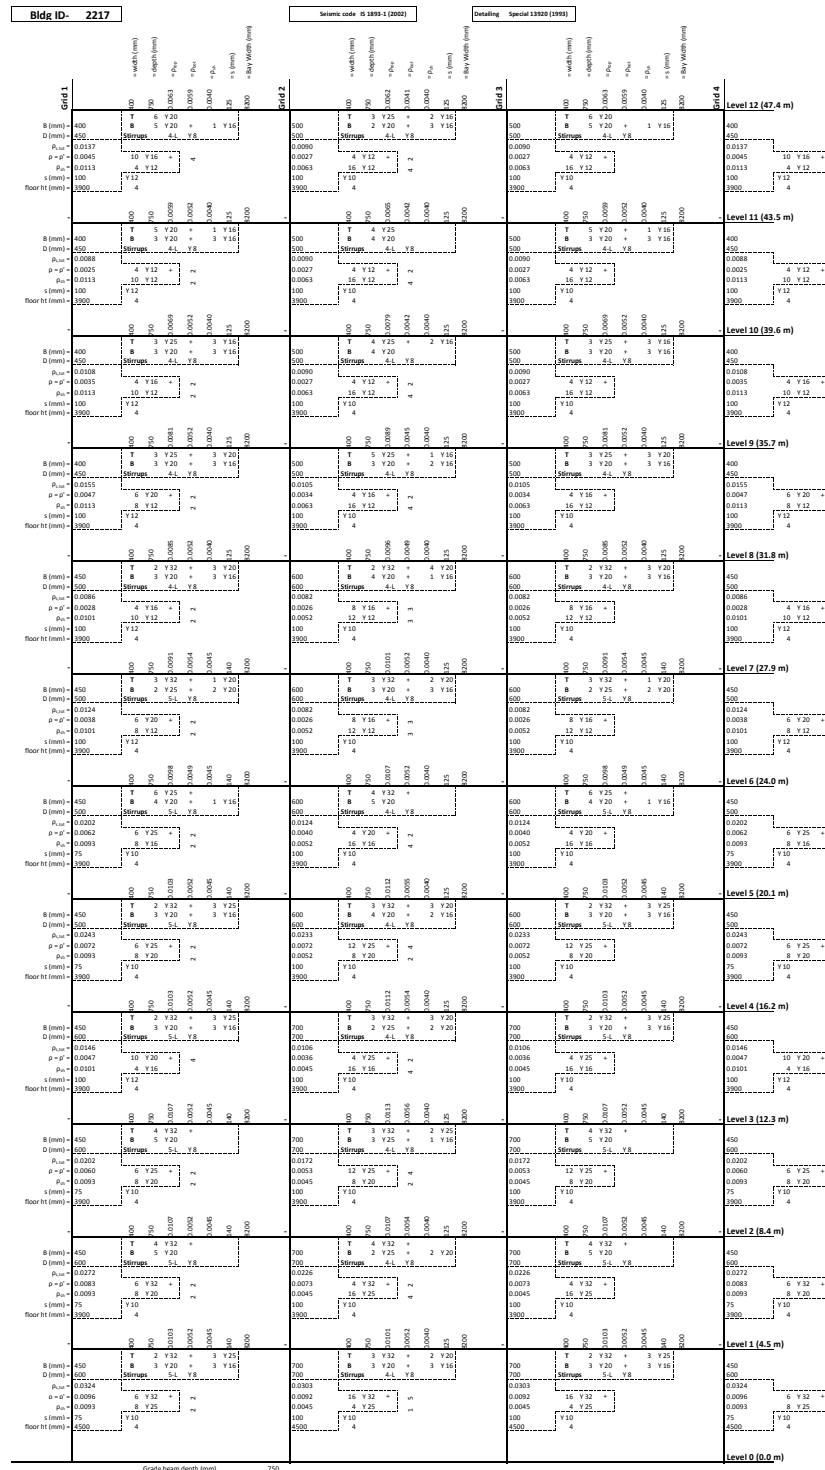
Provided reinforcement and modeling details for building ID 2217
